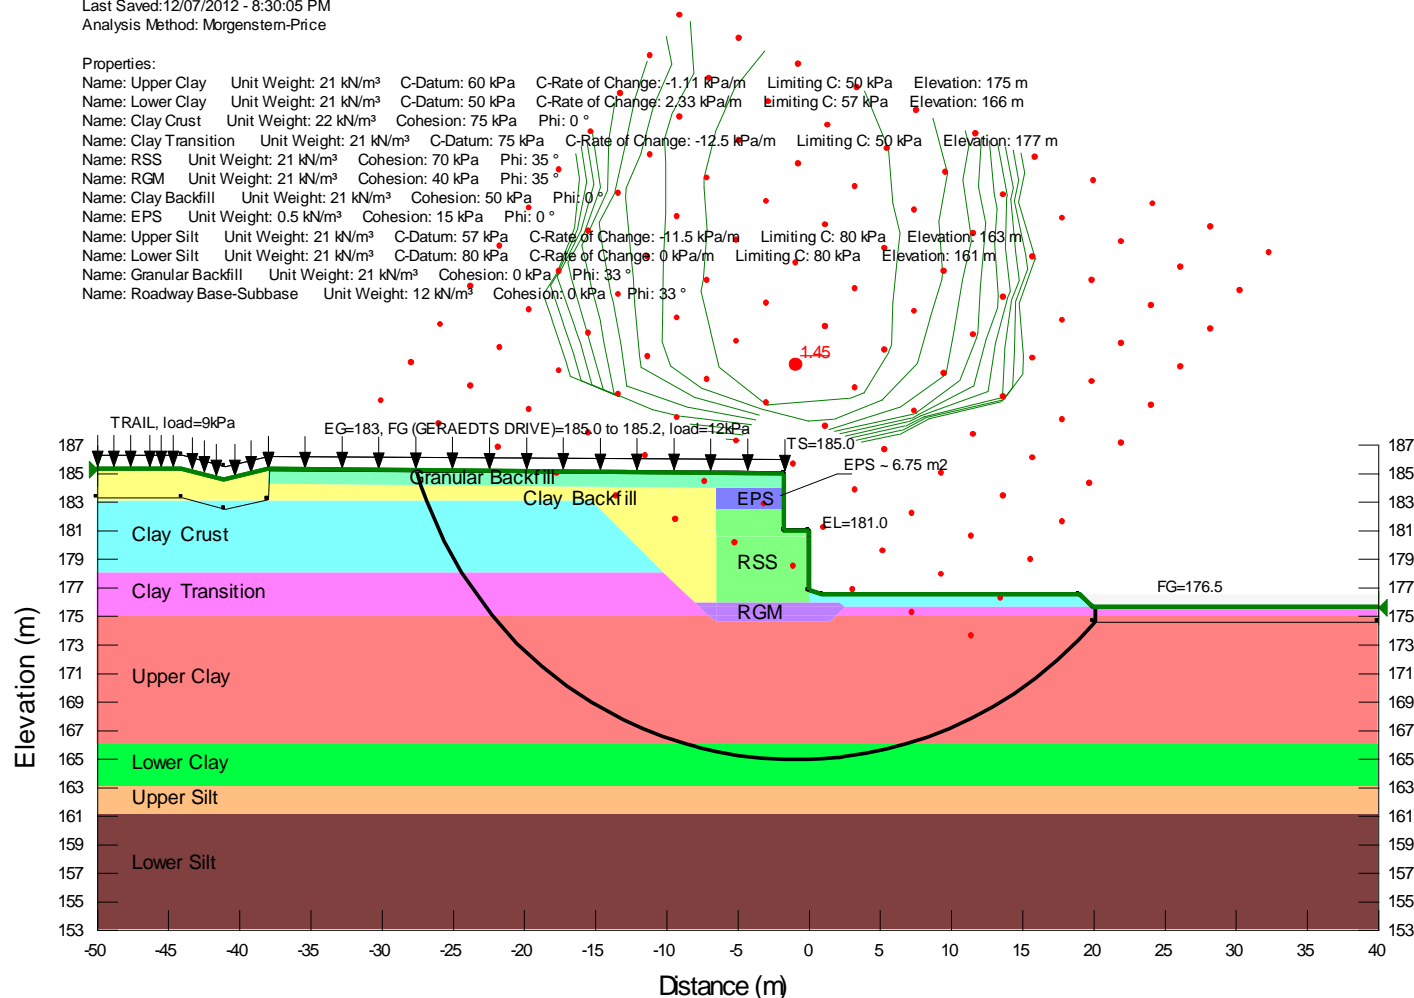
Global Stability Result – South Abutment (Geraedts Drive) – End of Construction (Undrained) Loading
